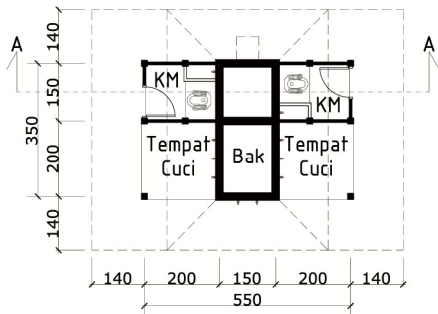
The Plan of Integrated Bathing - Washing - Toilet - Water Tank Facility.
